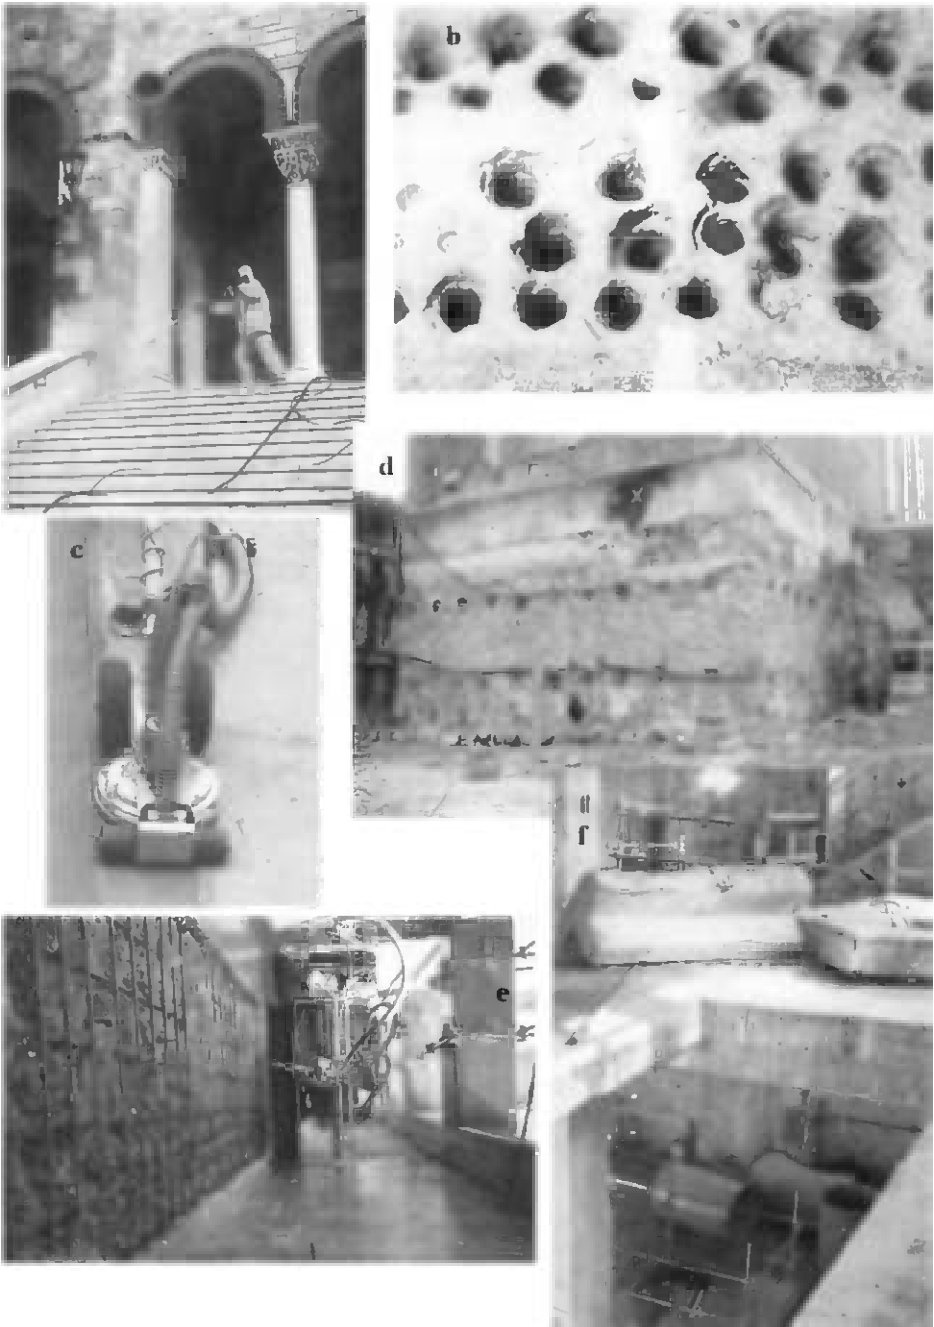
Civil and construction engineering applications of water jets (a) surface cleaning (WOMA GmbH, Duisburg); (b) rock drilling (BMGR, RWTH Aachen, Aachen); (c) floor decontamination (Hammelmann GmbH, Oelde); (d) soil stabilisazion (Keller Grundbau GmbH, Fallingbostel); (e) hydrodemolition (AquaJet Systems AB, Holsbybrunn); (f) building demolition (WOMA GmbH, Duisburg)
